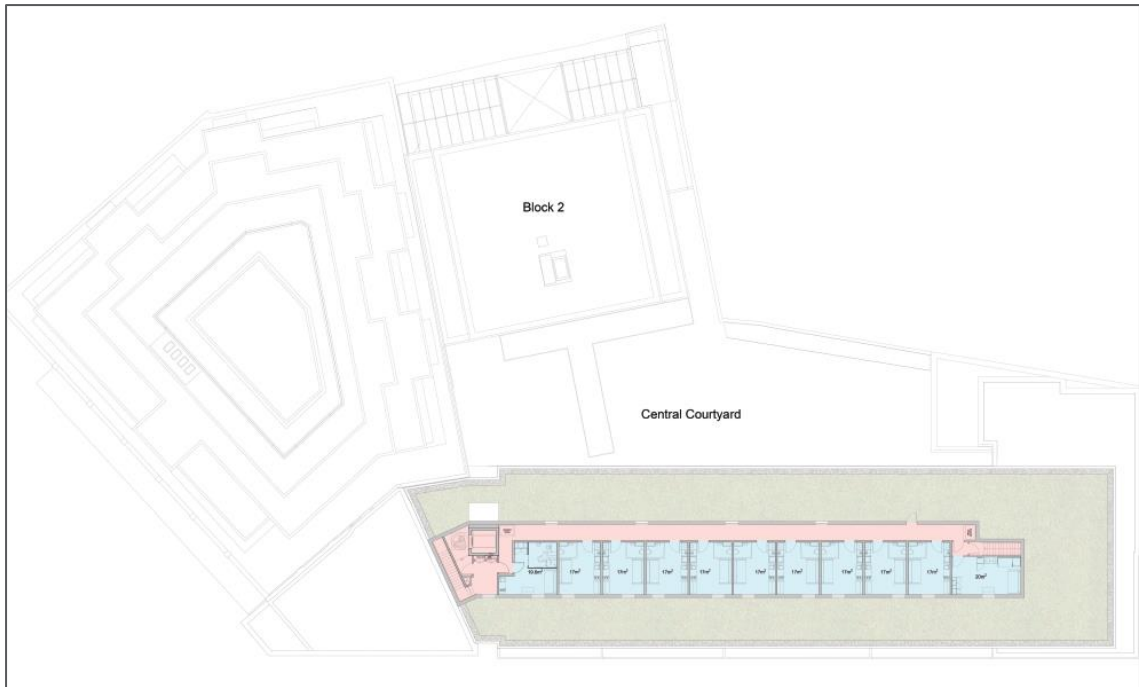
Proposed 7th Floor Plan (source: Contemporary Design Solutions, August 2023)
